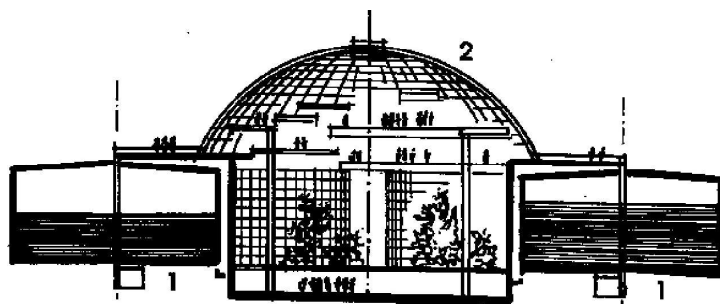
Reykjavik, Iceland. Geothermal heating plant. Drawing by author based on original drawing.
